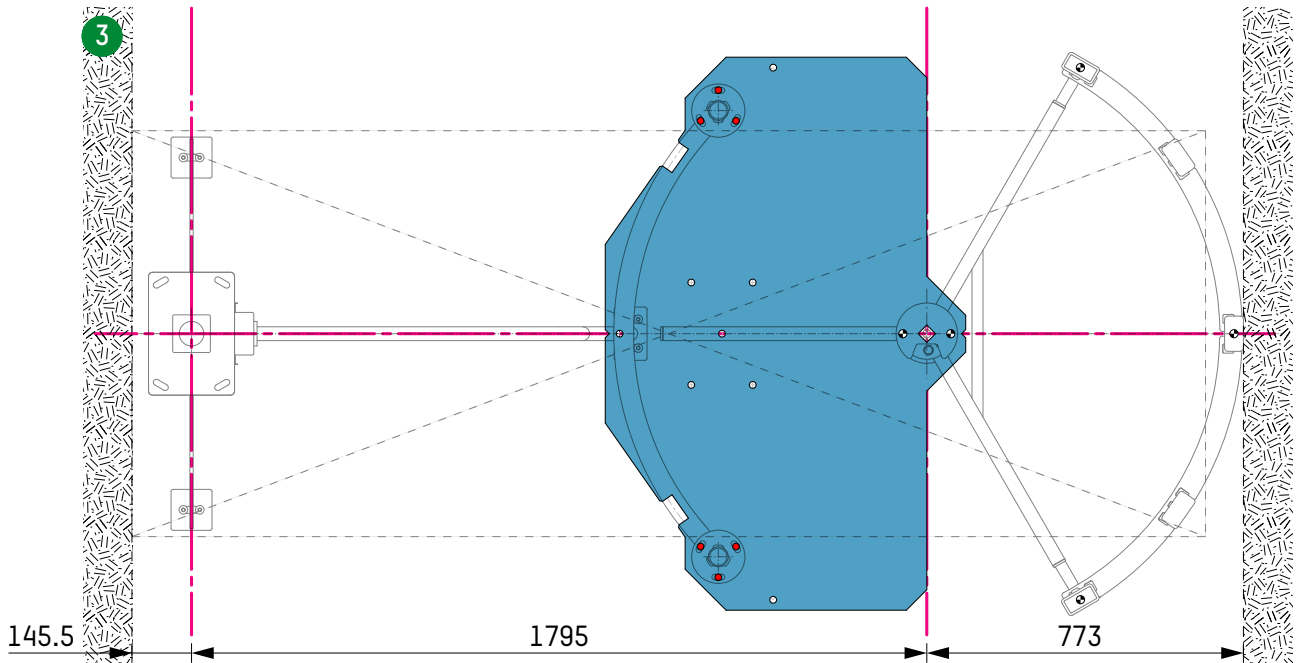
Drilling template (GAB-E-0113963) - Drawing the fixing points of the handrail (Step 3)
